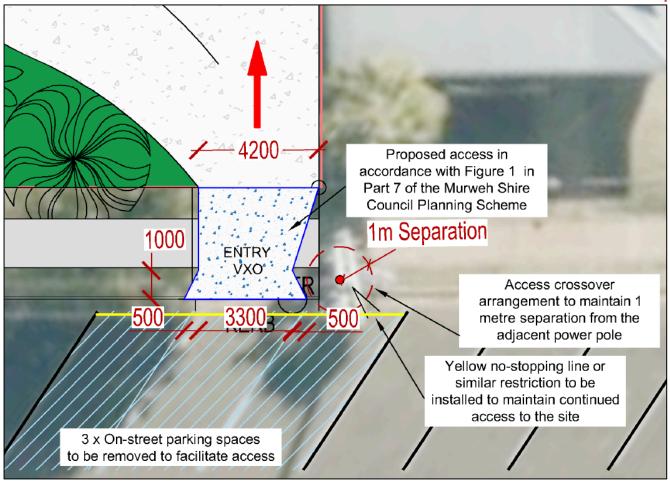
DETAIL A - Detailed Galatea Street entry crossover design
